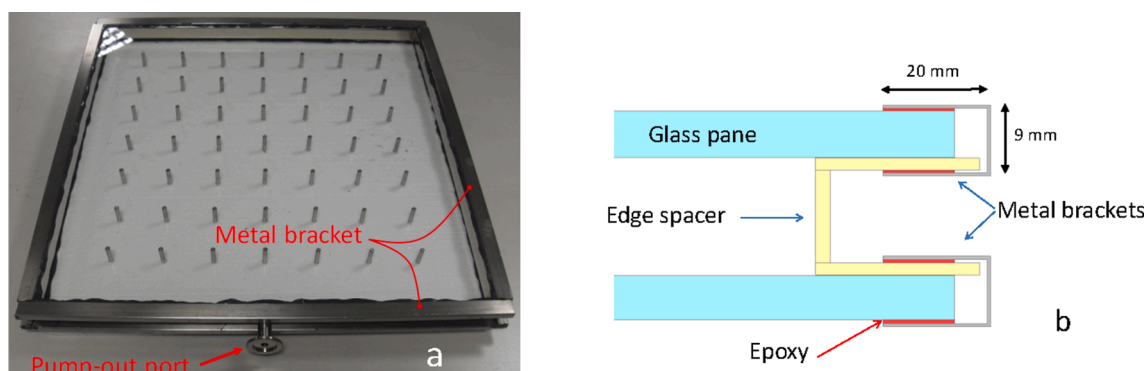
Completed vacuum enclosure (a), U-shape section added to enclosure (b).
